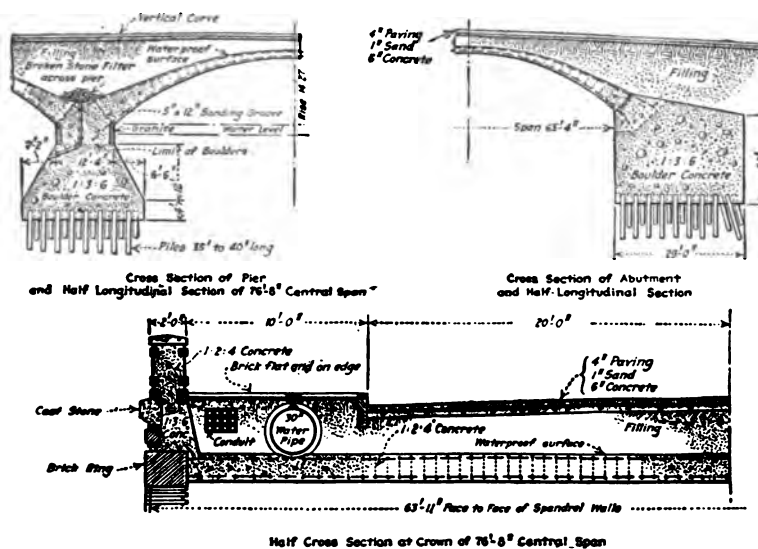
Details of Lars Anderson bridge over the Charles River, Cambridge and Boston, Mass.
